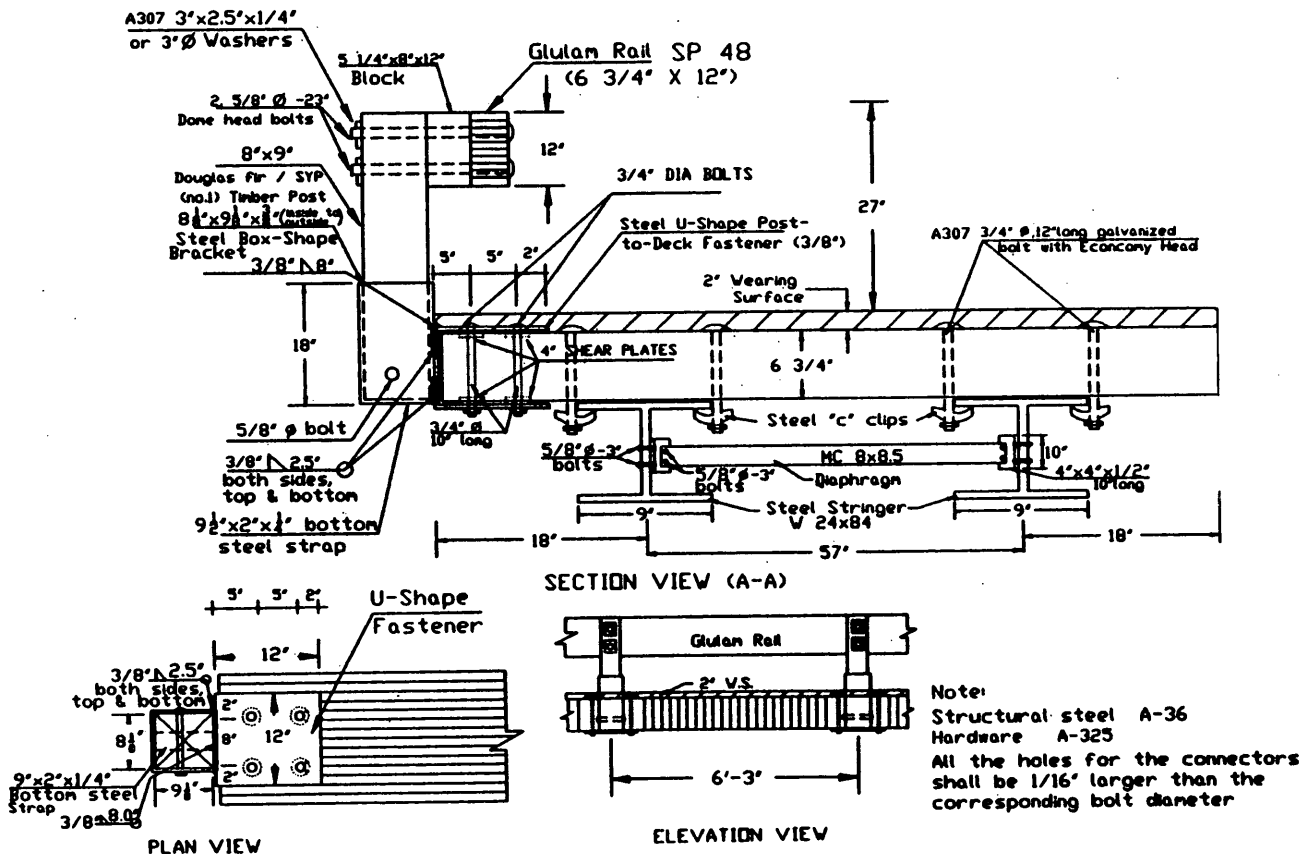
Timber Bridge Rail System 1 for PL-1: cross-sectional details of bridge rail.
